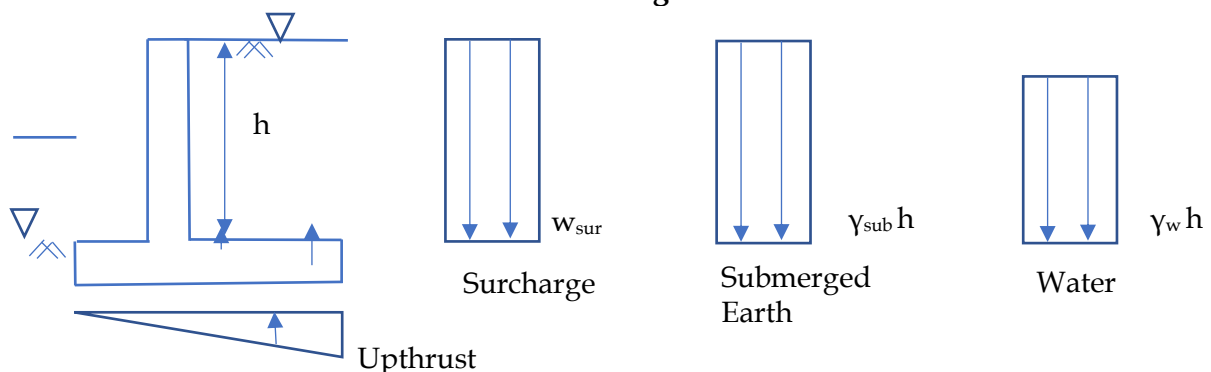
Vertical Pressure Loads acting at Case 3 on the Retaining Wall
